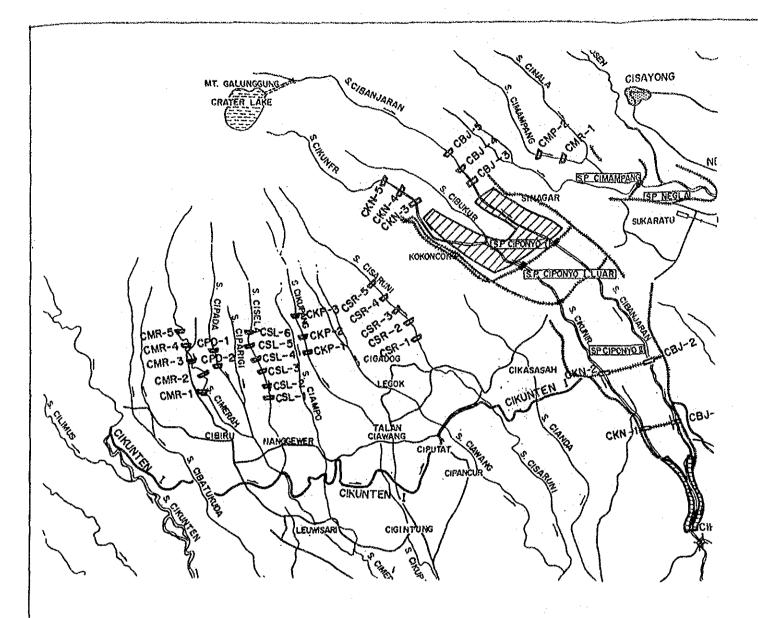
General Plan of Check Dam on S. Cibanjaran
